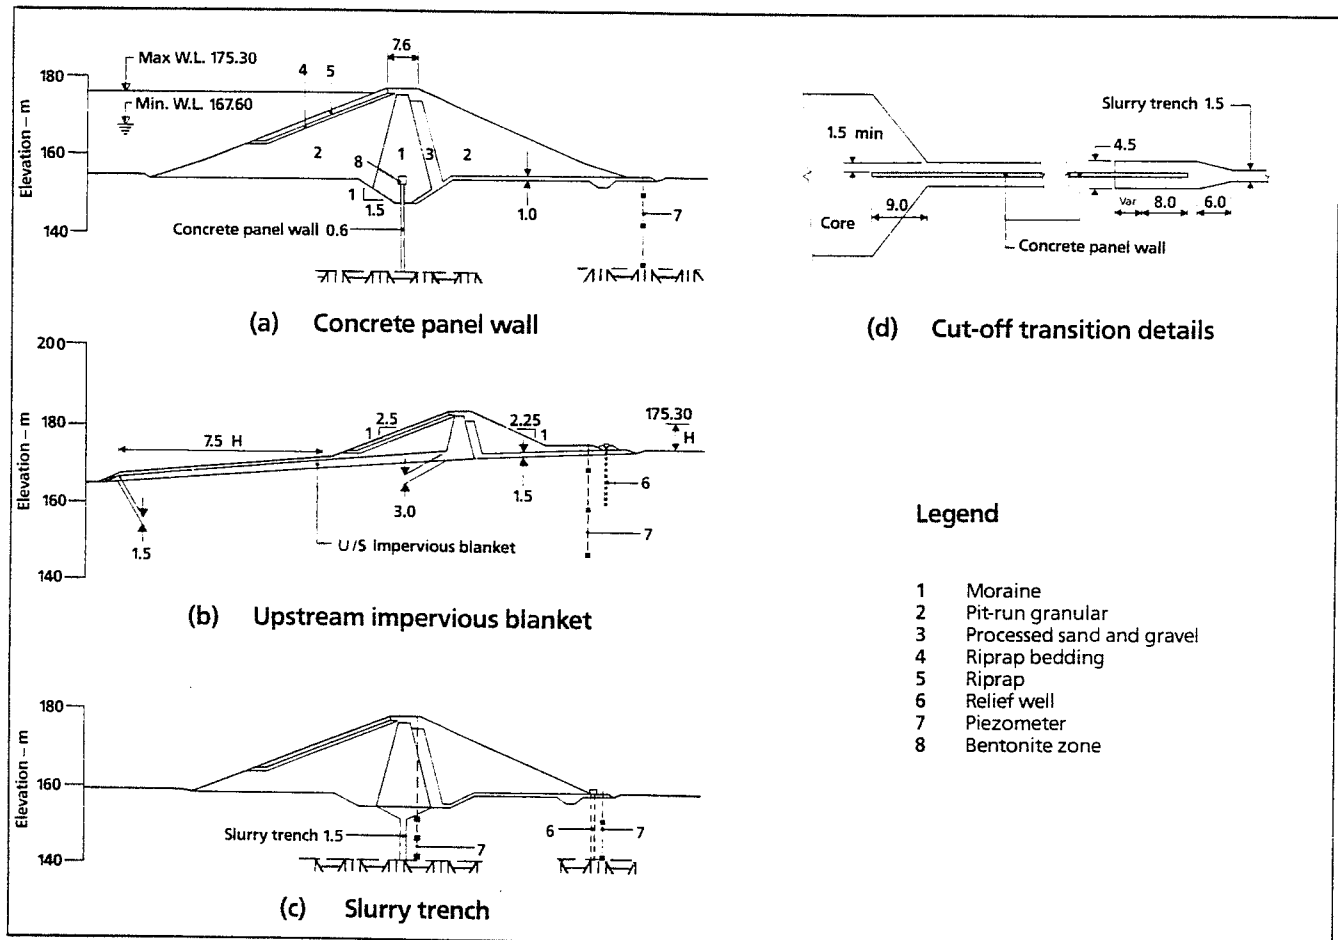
D 20 Dyke - Sections and cutoff transition details
